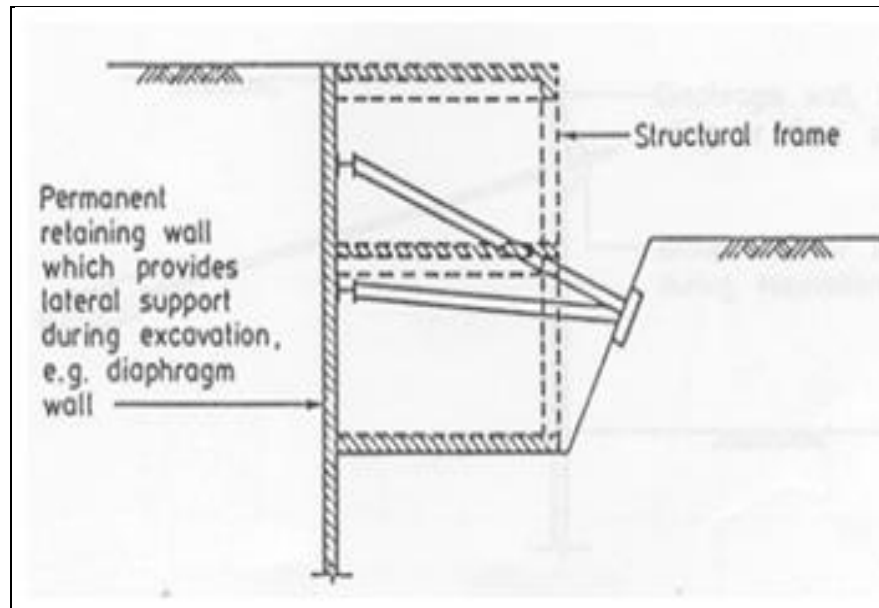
Permanent wall and two level temporary rakers for implementing main frame and slabs as a supporting system [2]
